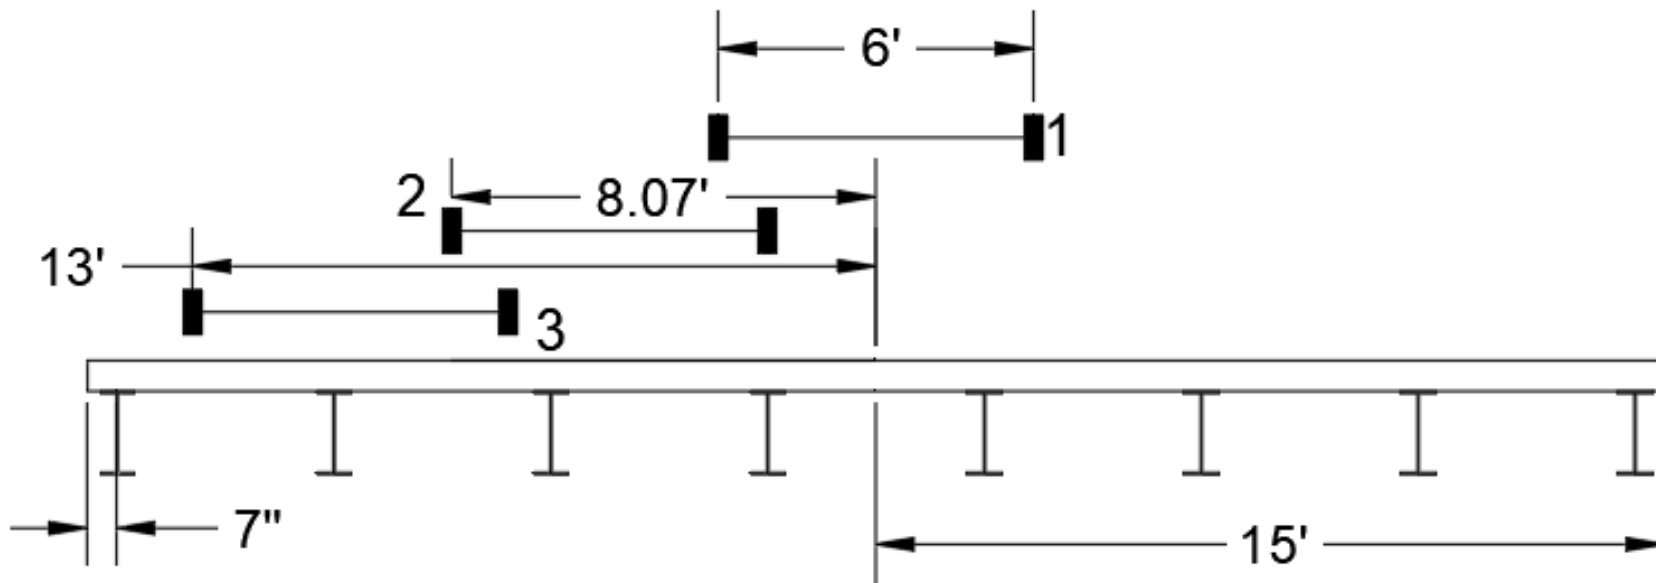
Load Test Plan for Yutan Bridge Load Test 1
